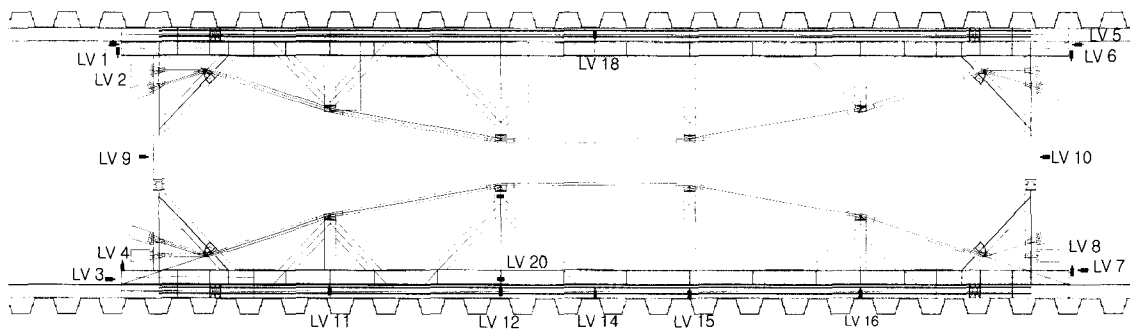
Full-scale test wall-plan view(at location of L.V.D.T)
